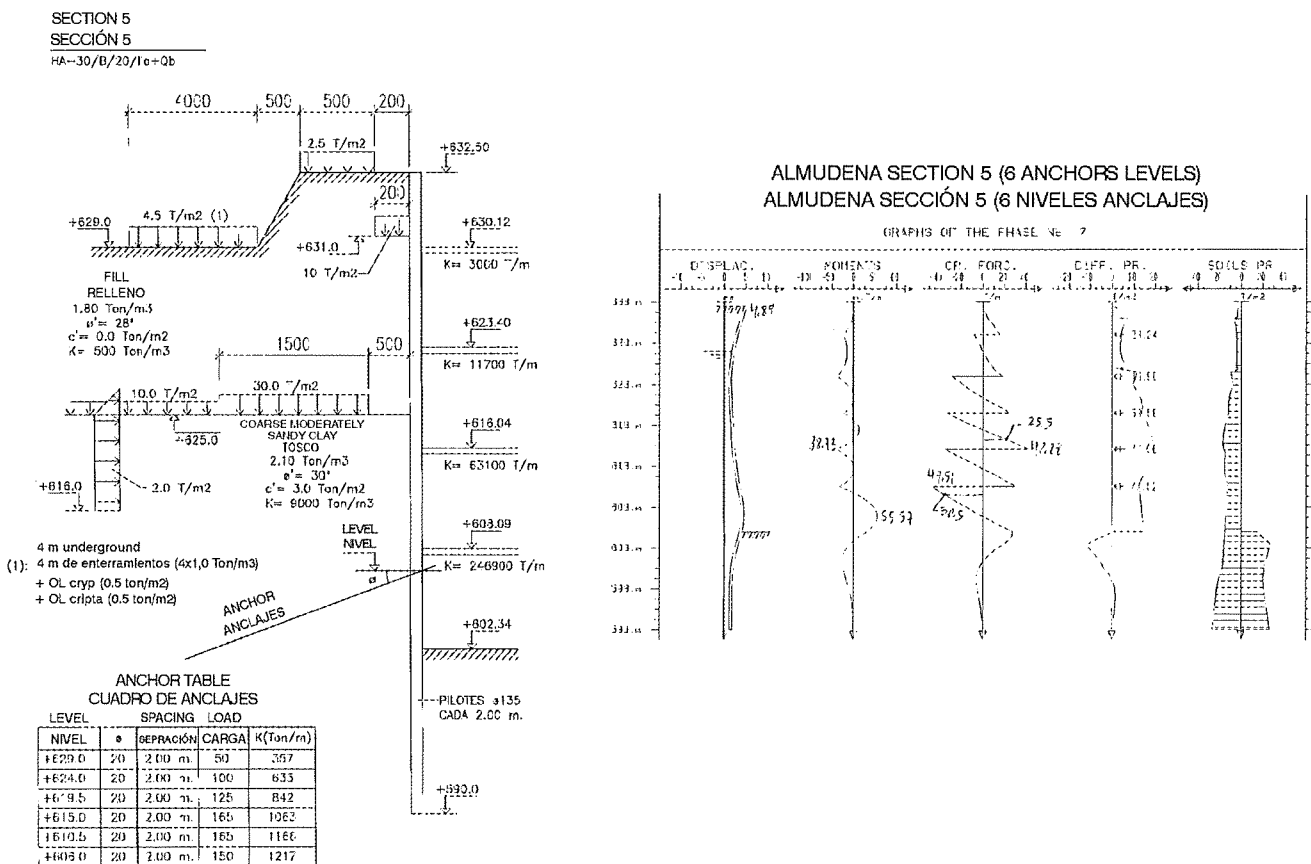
Section 5: design geometry (RIDO software). Earth Pressure, deflection and internal forces acting on the diaphragm wall with the excavation at its deepest. Source: FCC
